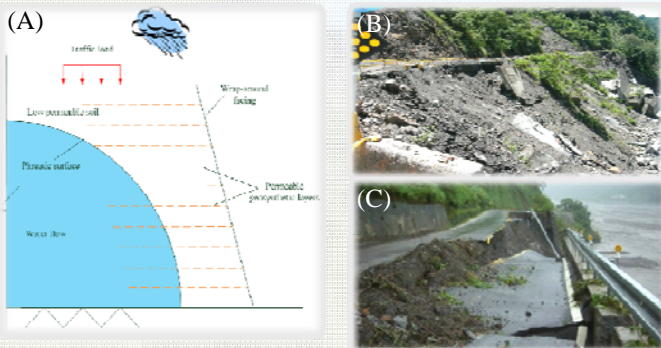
(A) Schematic of a geosynthetic-reinforced slope with marginal soil as a backfill. (B) & (C) Real cases of slope failure.
